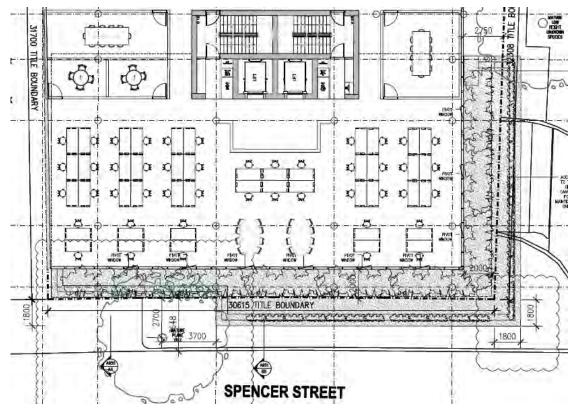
Excerpt of advertised level 1 plan showing proposed encroachment
